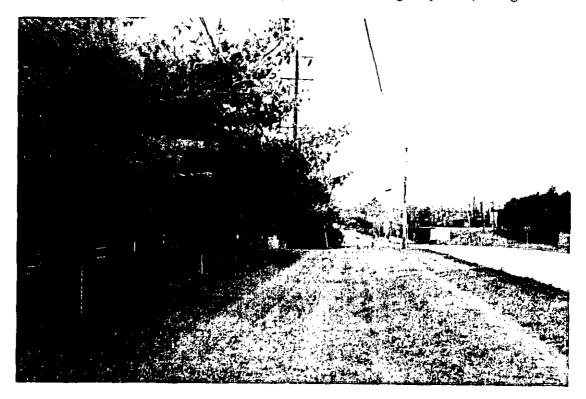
View of Proposed Route along Dixie Highway/SR 4, facing north.
